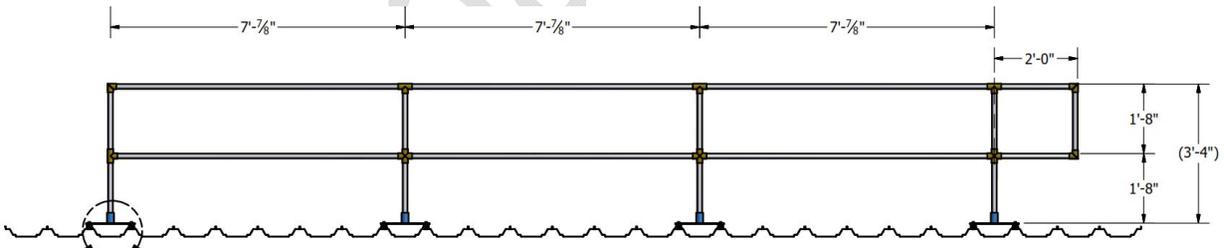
Elevation view of Support Facility handrail at edge of roof.
